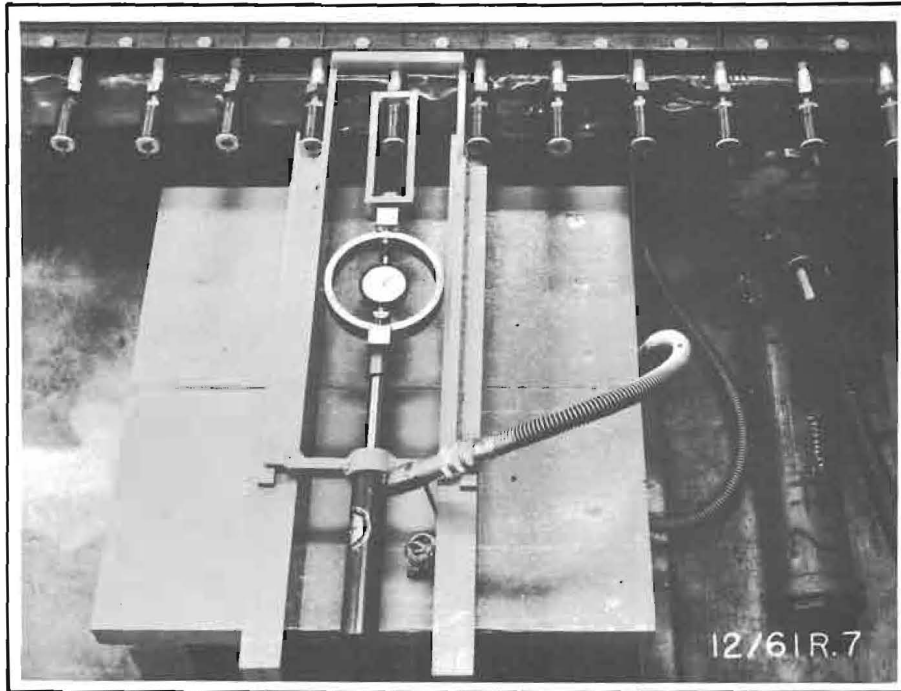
Arrangement used, including hydraulic jack, ram, and proving ring, for tensioning the stressing wires.
